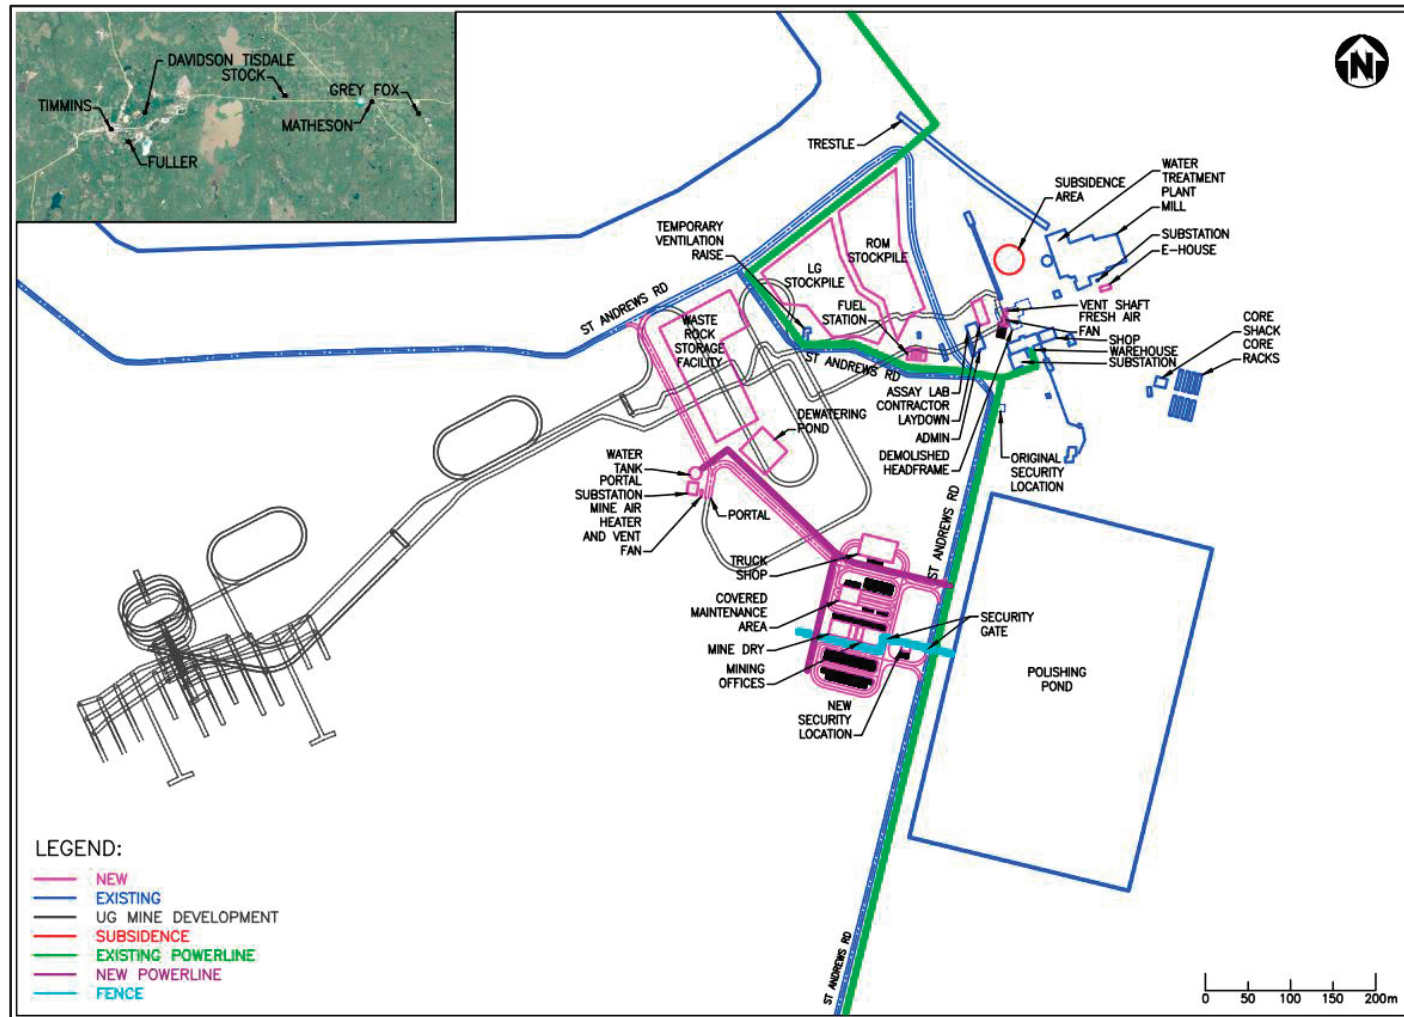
Stock Site Layout (prepared by Wood, dated 2021)
